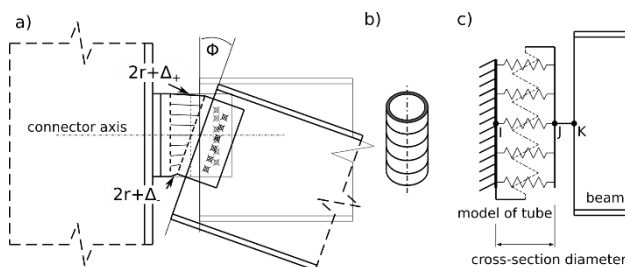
a) connector assembly b) tubular part of connector c) mechanical model of connector
